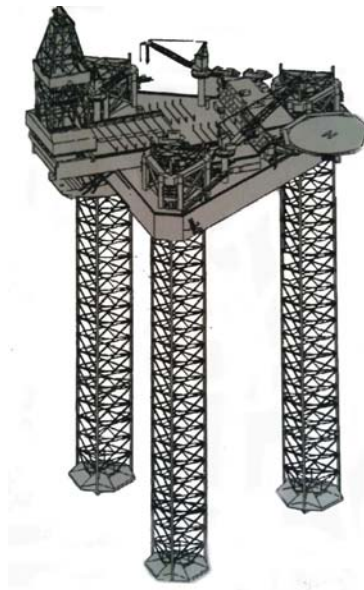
A typical three-legged Jack-Up platform (adopted from [1])
